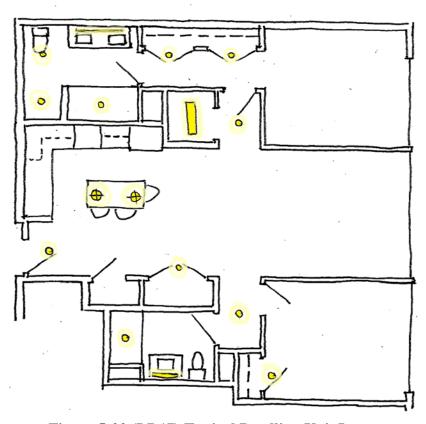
(LD17) Typical Dwelling Unit Layout
